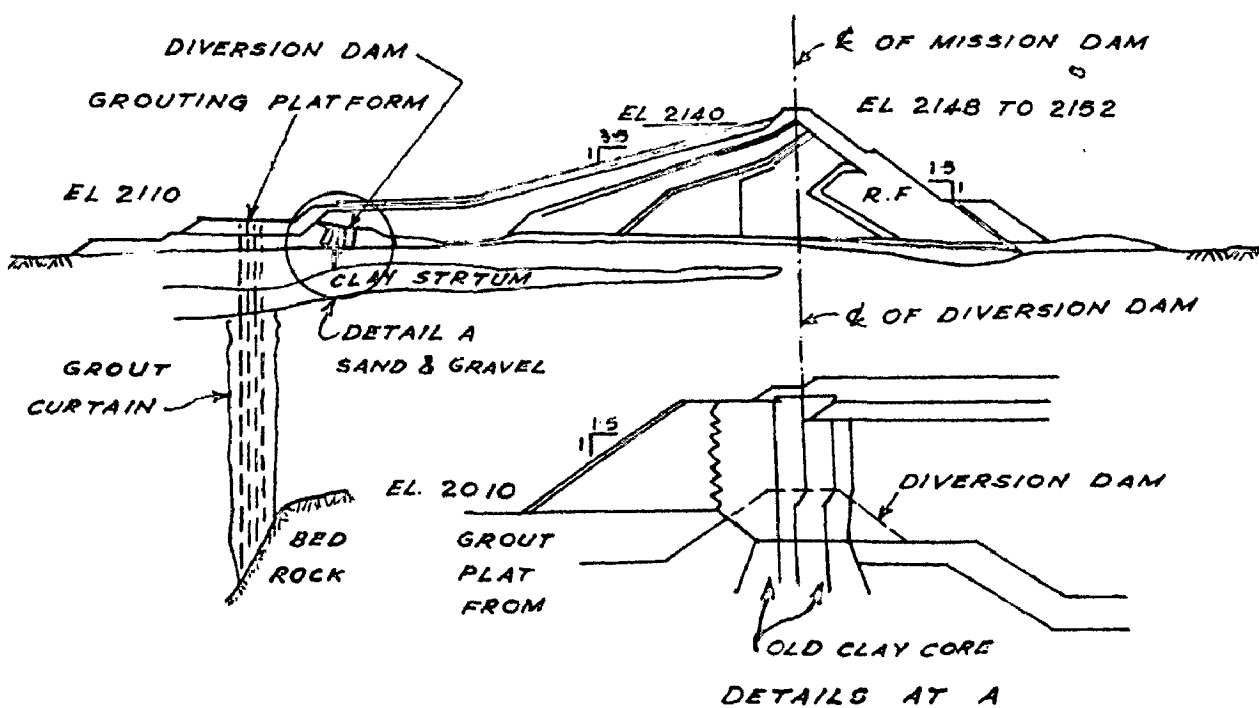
CROSS SECTION OF MISSION DAM SHOWING CUT OFF WALL
